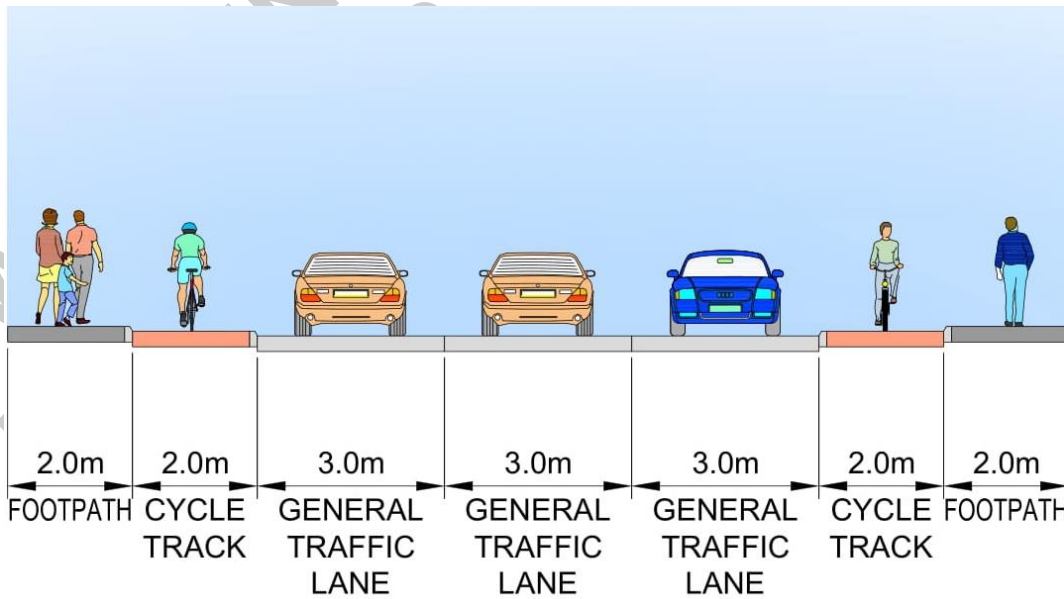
Section 2, Proposed Option 4c – Cross Section A-A
